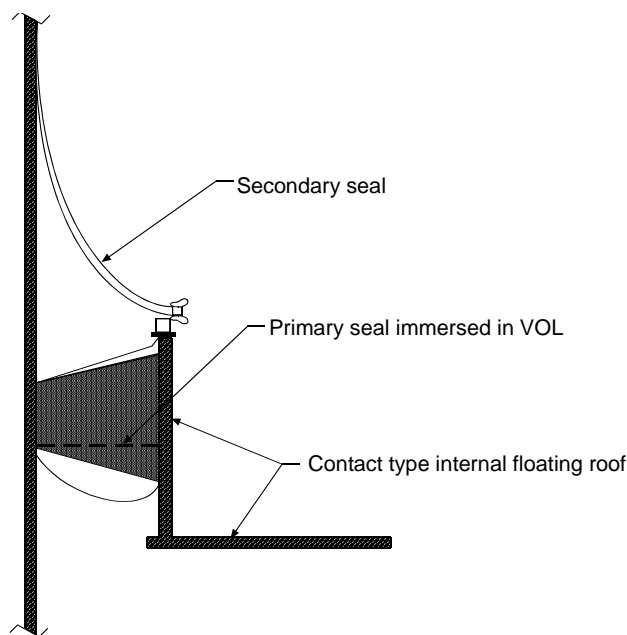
Rim-mounted secondary seal on internal floating roof
